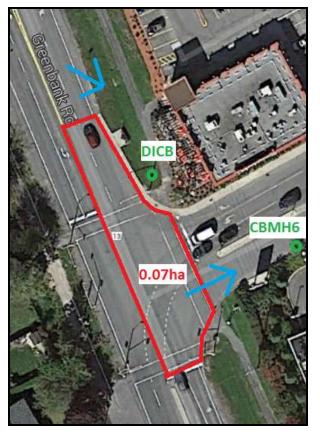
Drainage Area from Greenbank Road to CBMH6 (Google, 2014)
